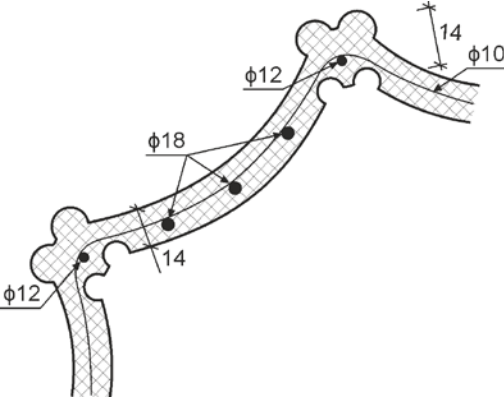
Sketch of a pillar strengthened by jacking (redrawn after the construction logbook)
